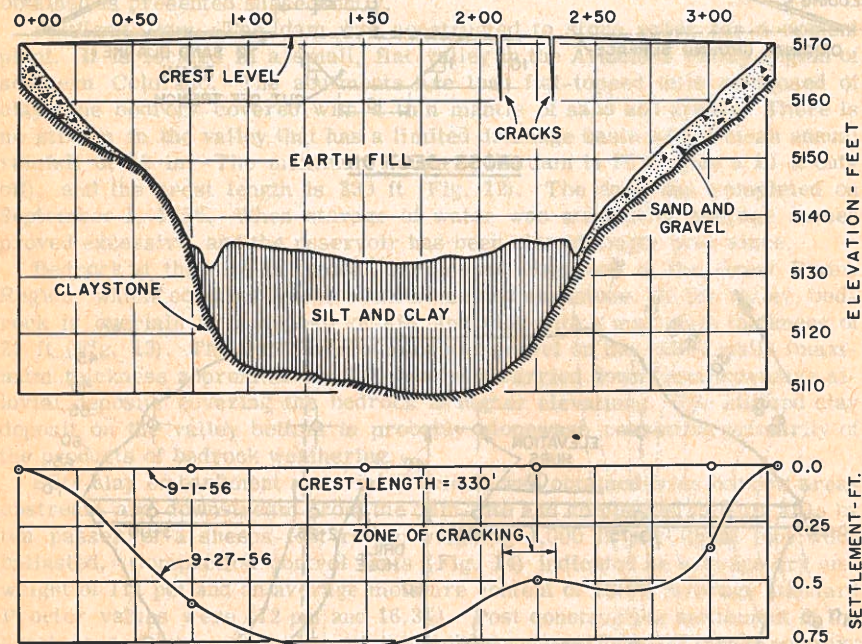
PORTLAND DAM: PROFILE AND CREST SETTLEMENTS AT CRACKING
